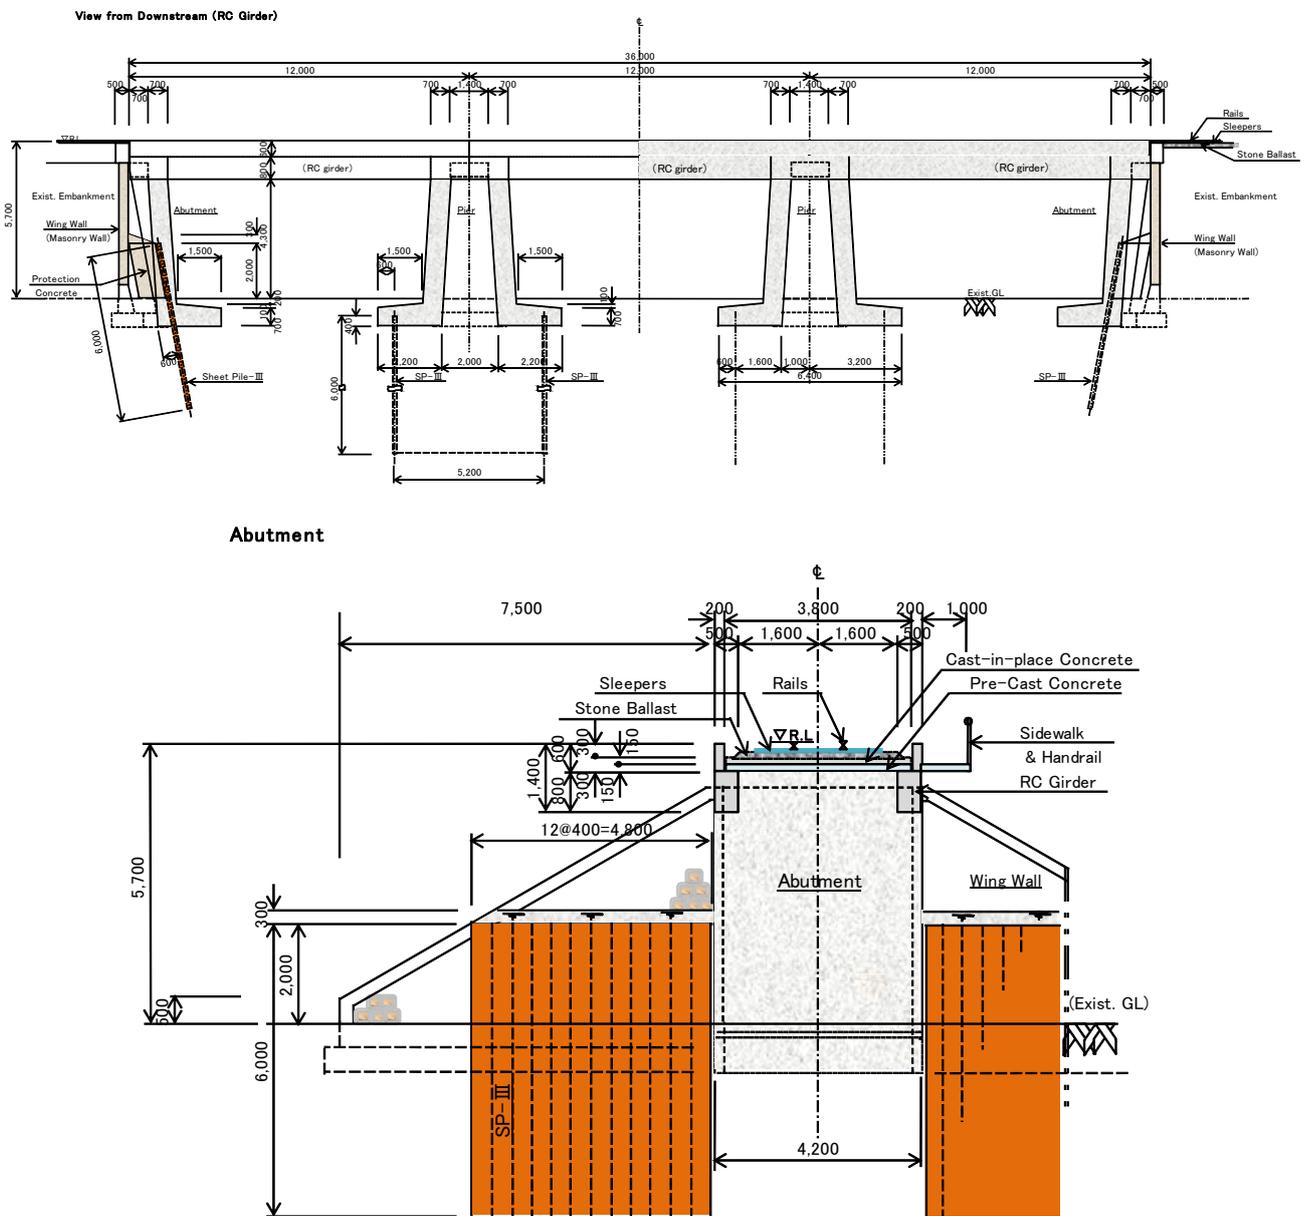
RC Bridge (Reconstruction Plan, 1/2)
